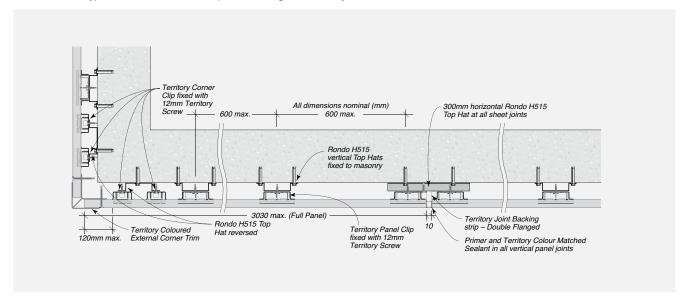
Typical Territory System Cross Sectional Detail for Steel Framing where Face Fixing is required – Elevation
